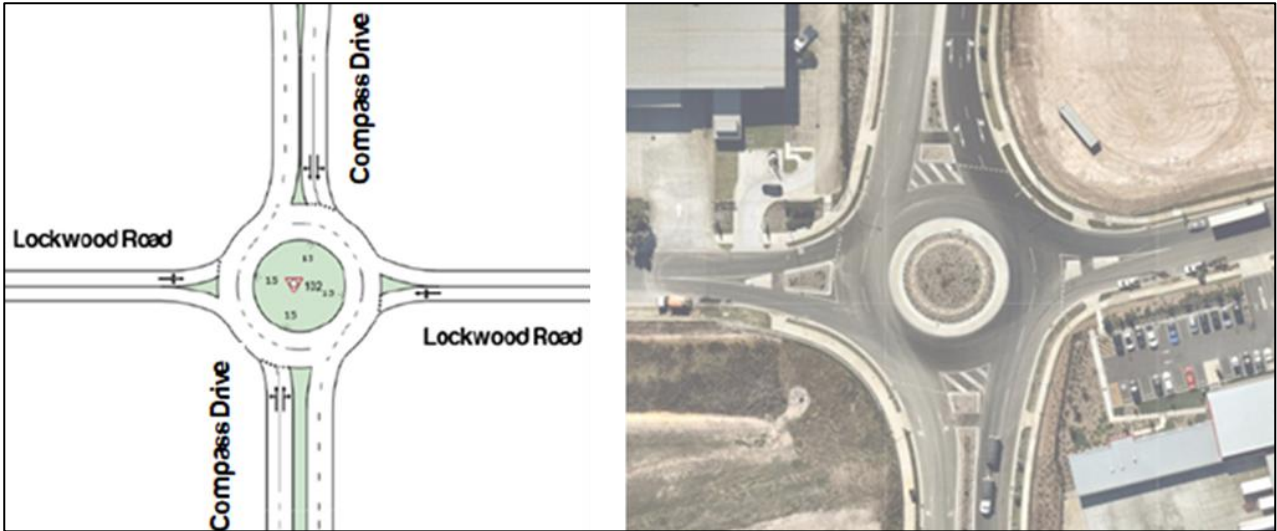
Intersection Layout of Compass Drive & Lockwood Road
